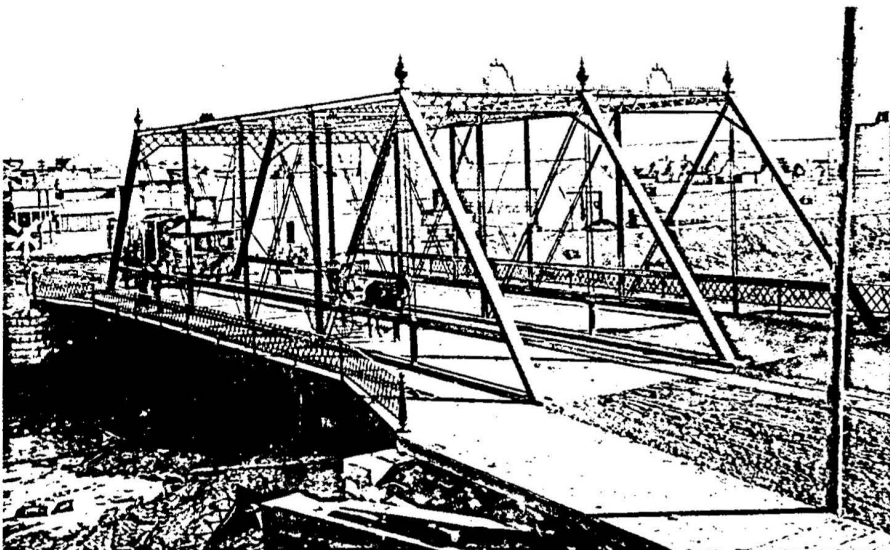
Steel Truss Bridge at Las Vegas. This steel truss bridge was built over the Gallinas River about 1886 and was replaced in 1909 by the existing concrete arch bridge (No. 1549). (Photograph Courtesy of the Museum of New Mexico, Negative No. 56291)
